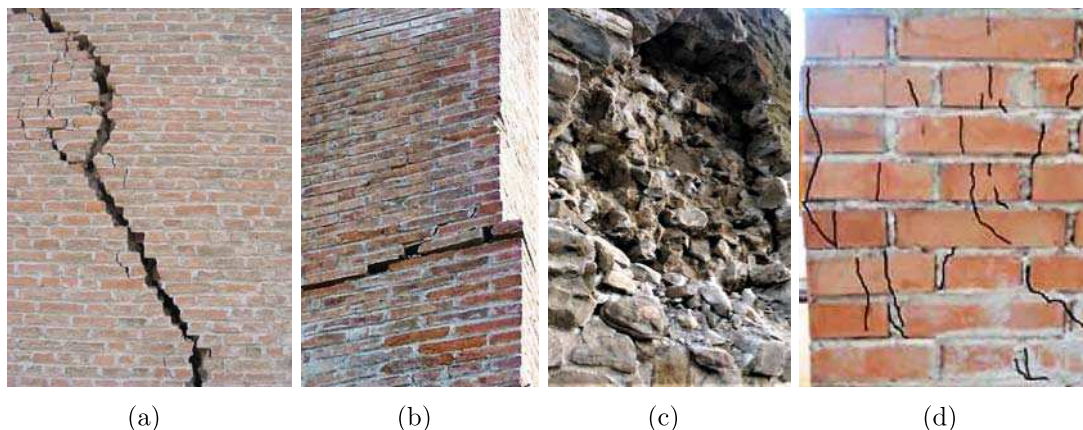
Masonry failure mechanisms (at a structural scale): (a) diagonal cracking, (b) sliding, (c) crumbling, and (d) crushing (from [12]).
